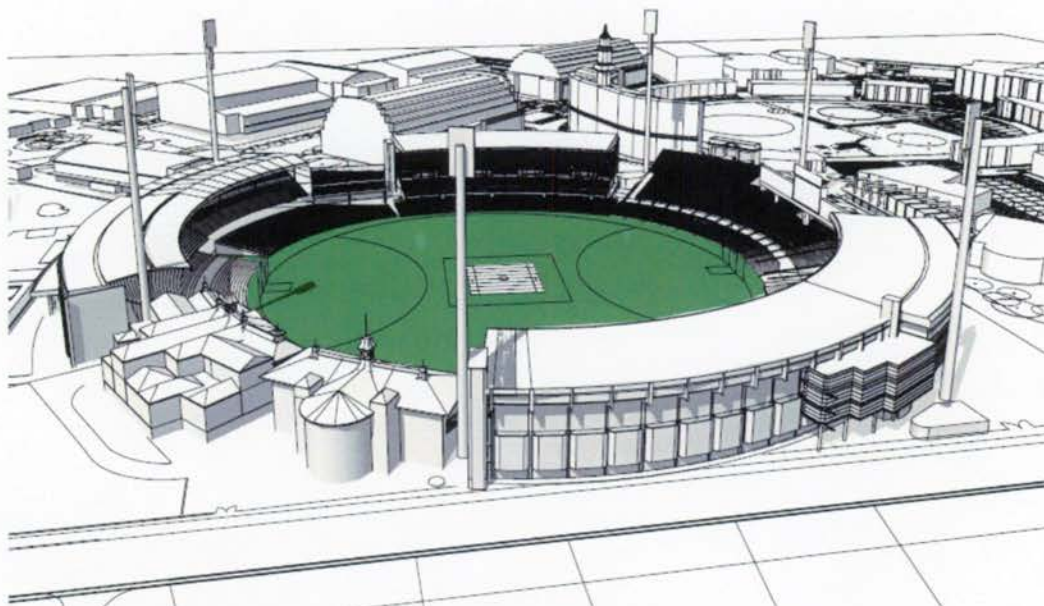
Axonometric Plan – Existing SCG (Source: BBC Consulting Planners)
